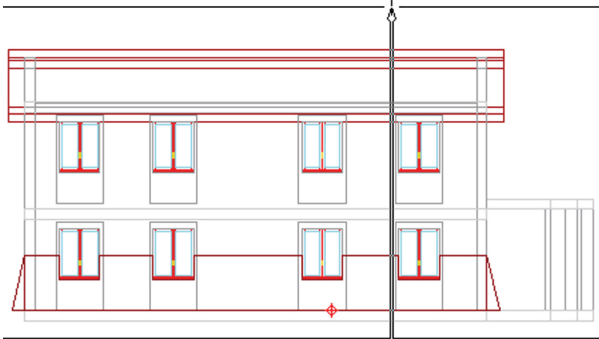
Cut 3D Object - Set Frontal 3D Plane
